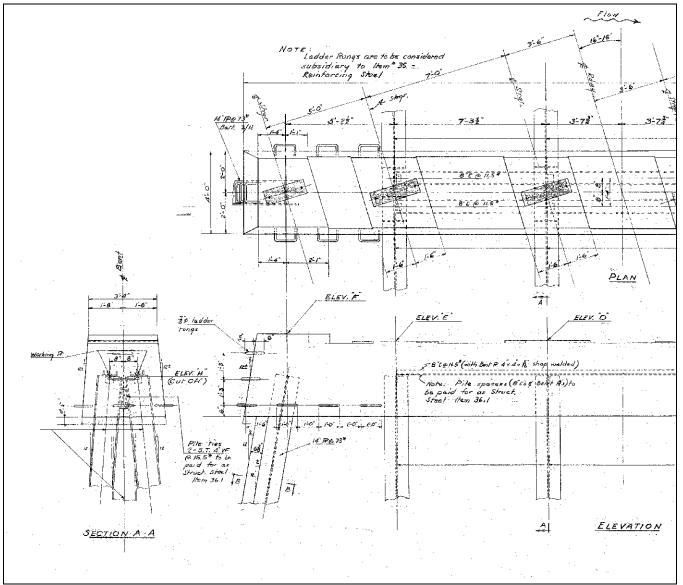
Plan, elevations and section of H-pile bent from original drawings (NHDOT File No. 3-4-3-2).
